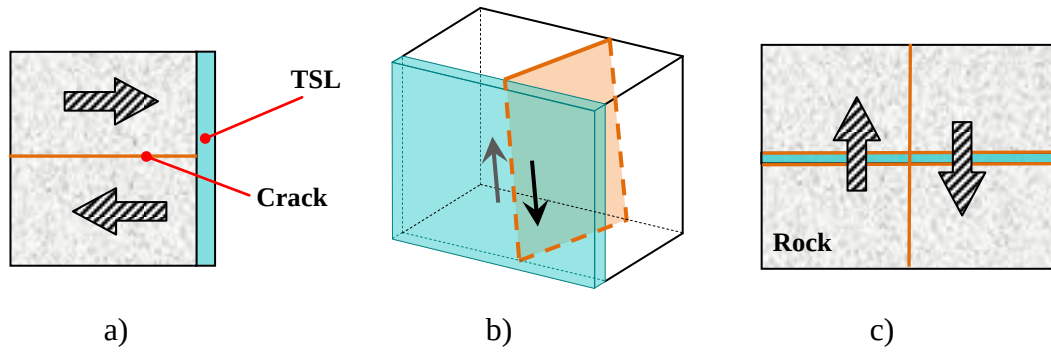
Material shear mechanisms: a) Out of plane on excavation surface, b) In plane on excavation surface, c) Across plane in a crack
